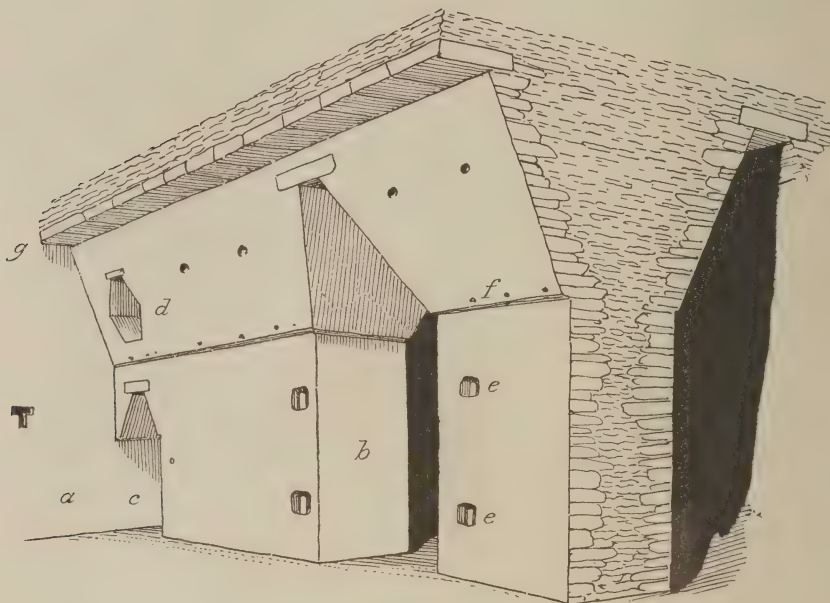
INTERIOR DOORWAYS (THROUGH MEDIAL WALL) WITH SECTION OF MEDIAL WALL AND CEILING.
